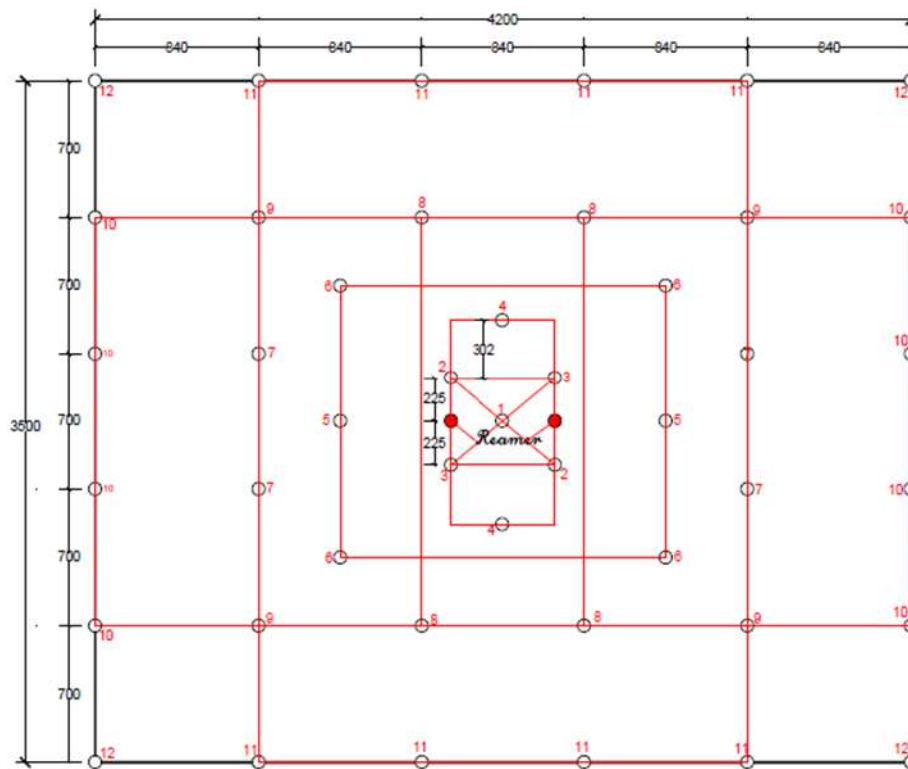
Existing blast design pattern of 4.2 m  $\times$  3.5 m used at Baroi underground mine, HZL.
